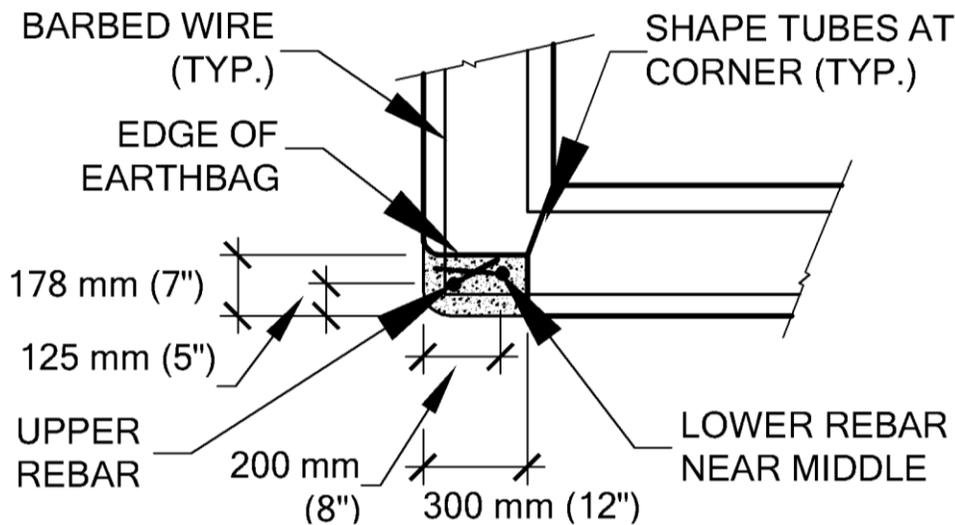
Use a narrow gap for an open concrete splice to connect upper and lower rebars.
